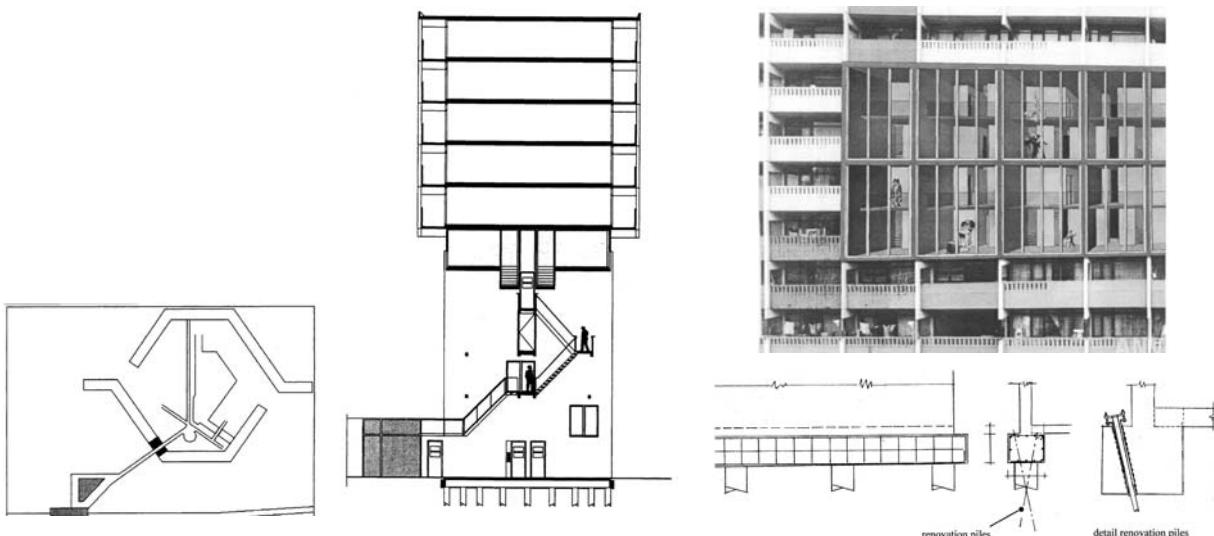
Position 'Hoge Poorthuis', in 'Gelderse poort'; vertical section through 'Hoge Poorthuis'; view of the facade of the 'etalagehuis' with new balconies.
